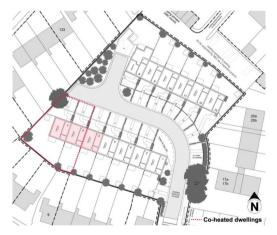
Site plan highlighting the co-heated plots 6 and 7 as well as the just heated plot 5
